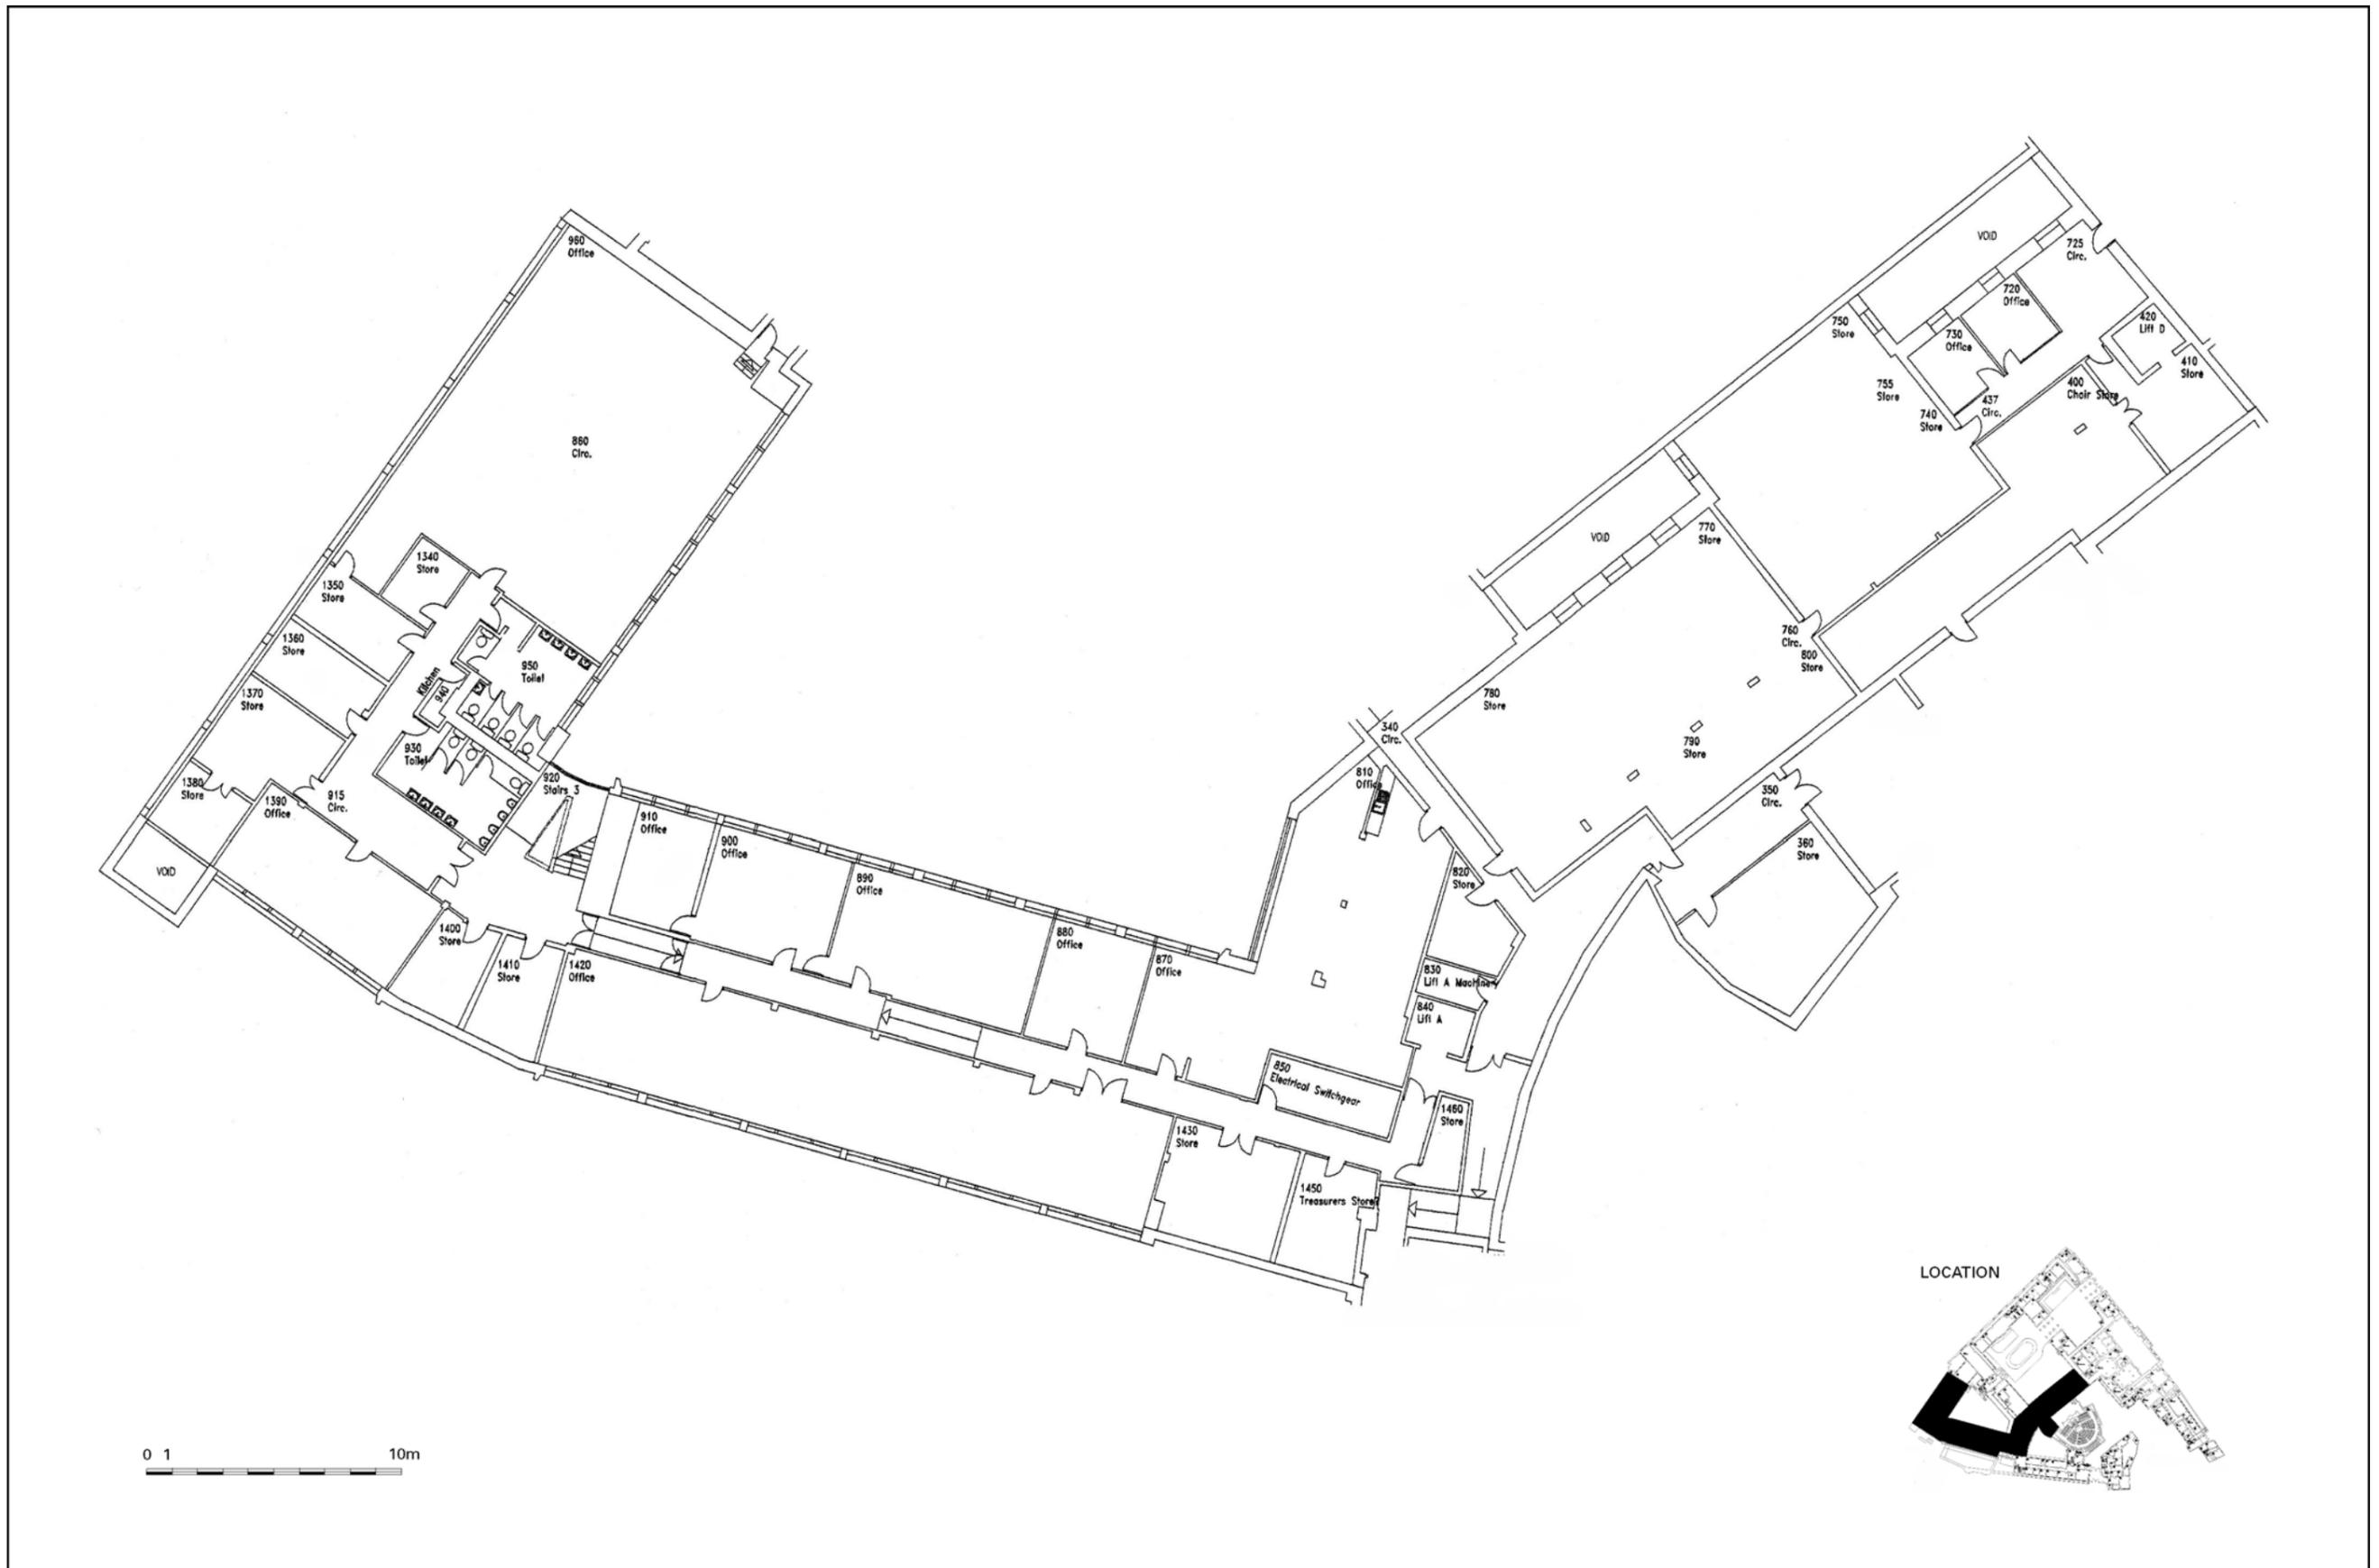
1966 Committee Rooms, Ante-chamber and Offices, basement plan
